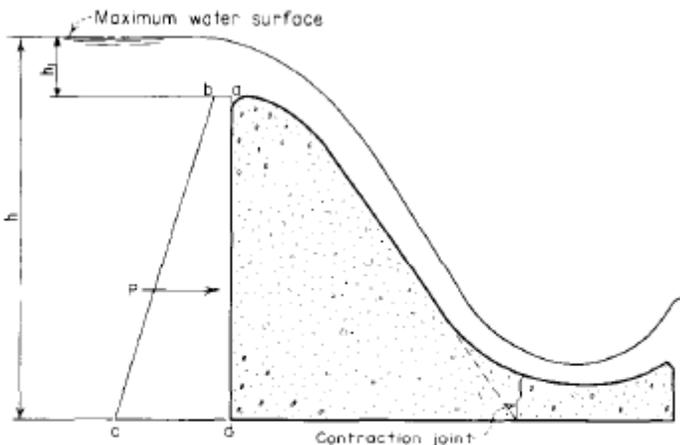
Water pressures acting on an overflow concrete dam. 288-D-2506.
